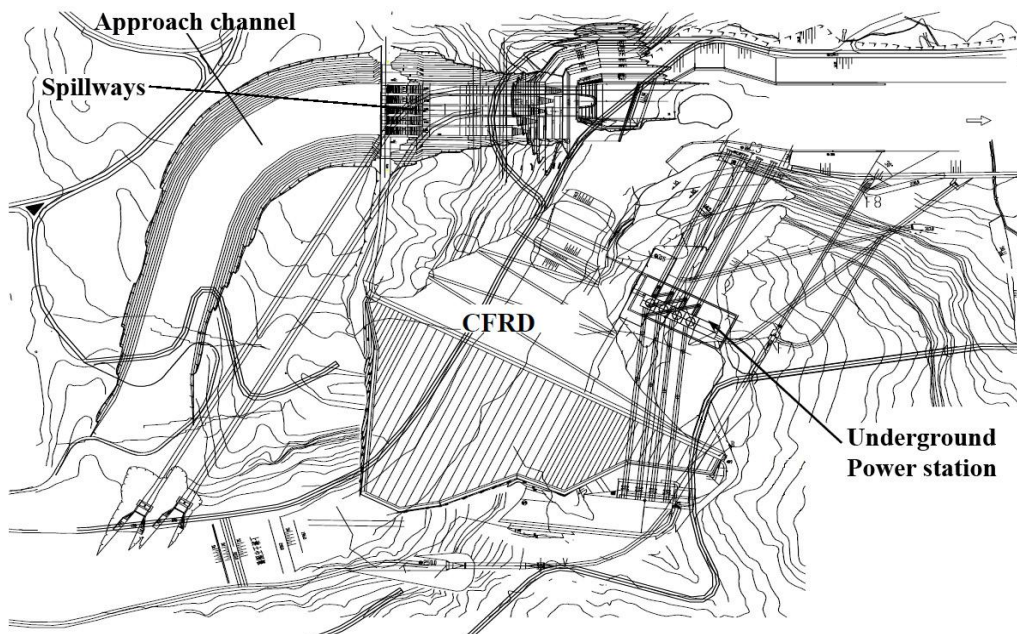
Plan view of the Shibuya Hydropower Project (Zhang et al, 2008)
